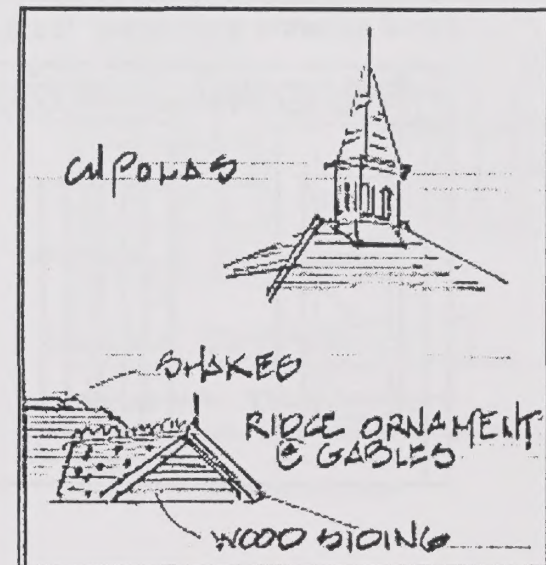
Ornamentation, such as that demonstrated above, has been used historically and is encouraged within the Corridor.
